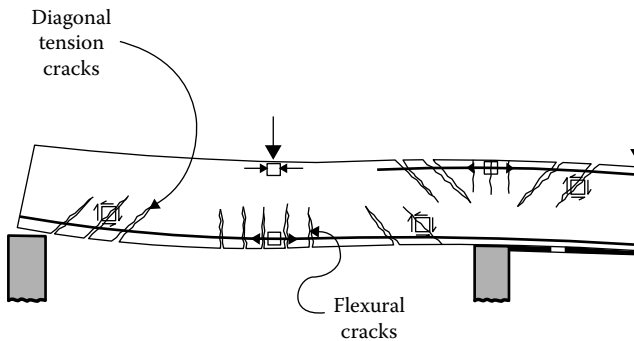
Development of cracks in a flexural member. Vertical cracks may develop near midspan, stable, hairline cracks are normal, but widening cracks indicate impending failure.
